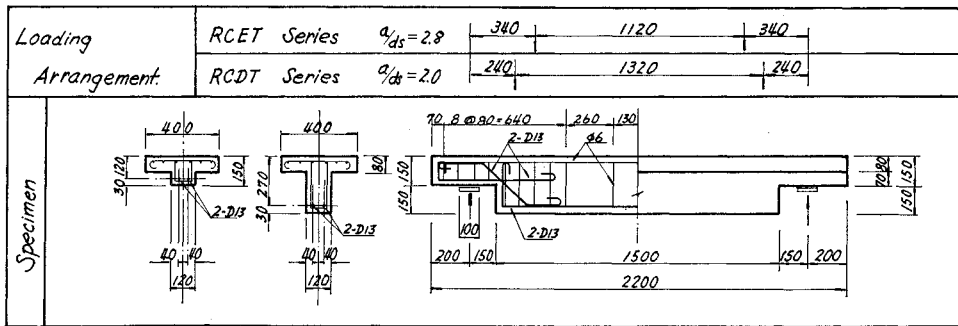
Specimens and loading arrangement of reinforced concrete T beams (two points loading test).
